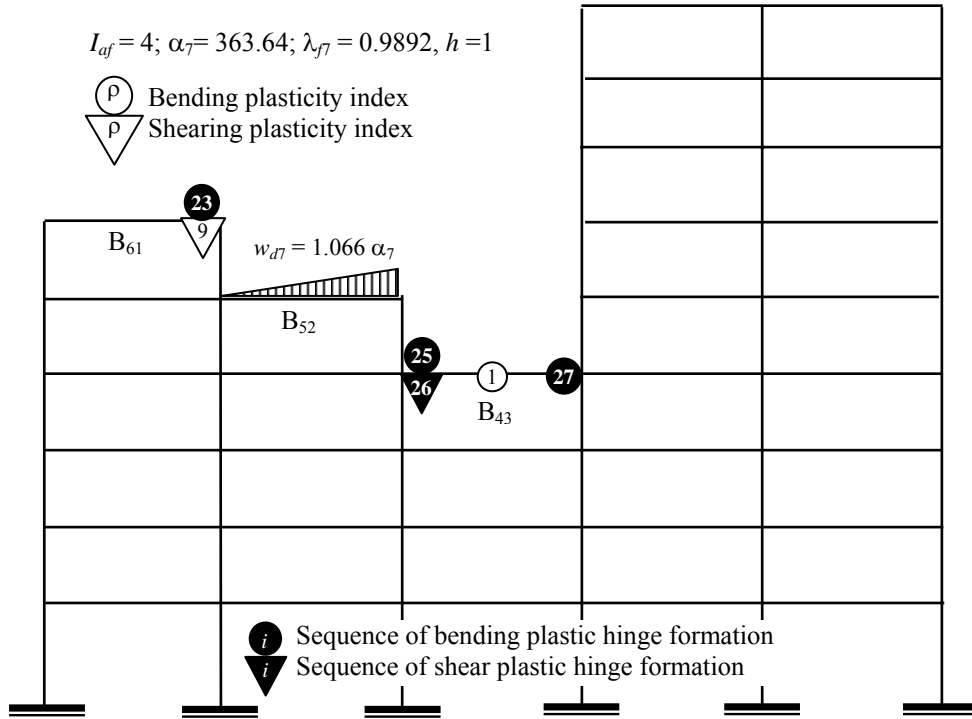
Example 2 (Los Angeles): Beam B₆₂ falls as debris loads and fails beam B₄₃ (Stage 7)
